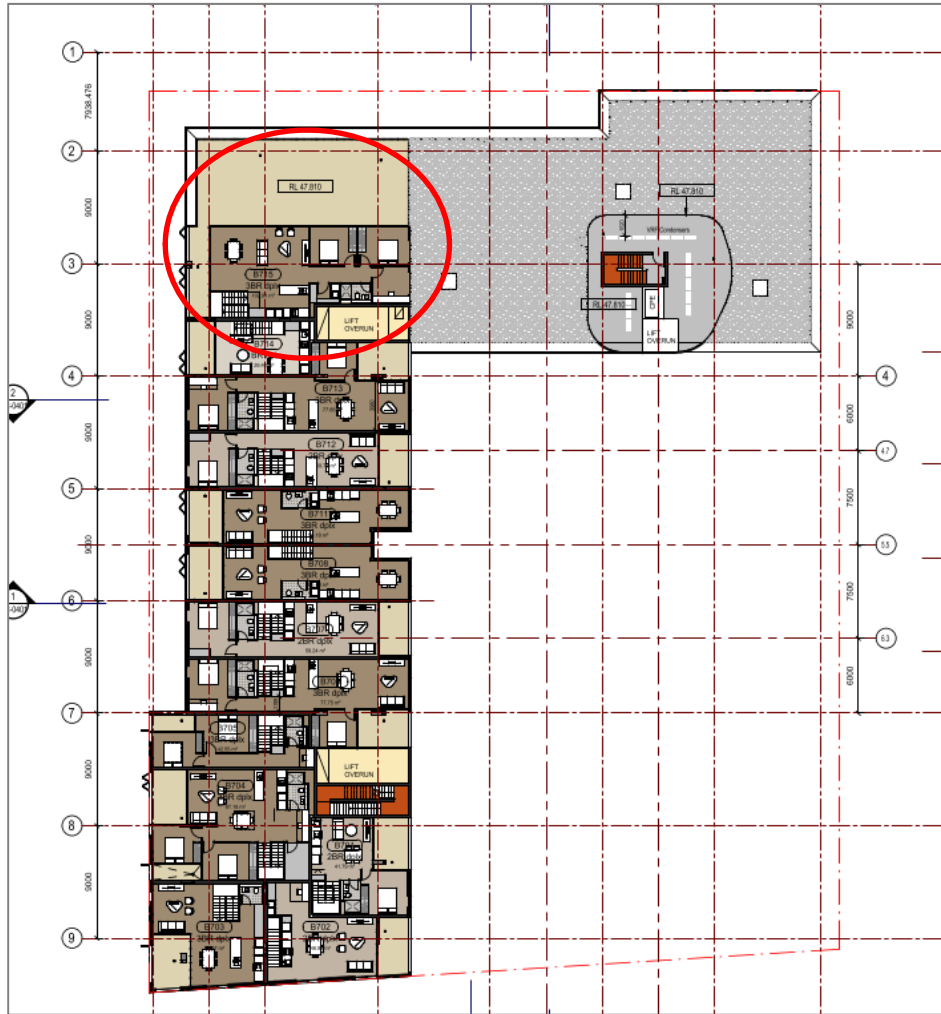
Building B Level 8 – showing area of additional storey to Building B
